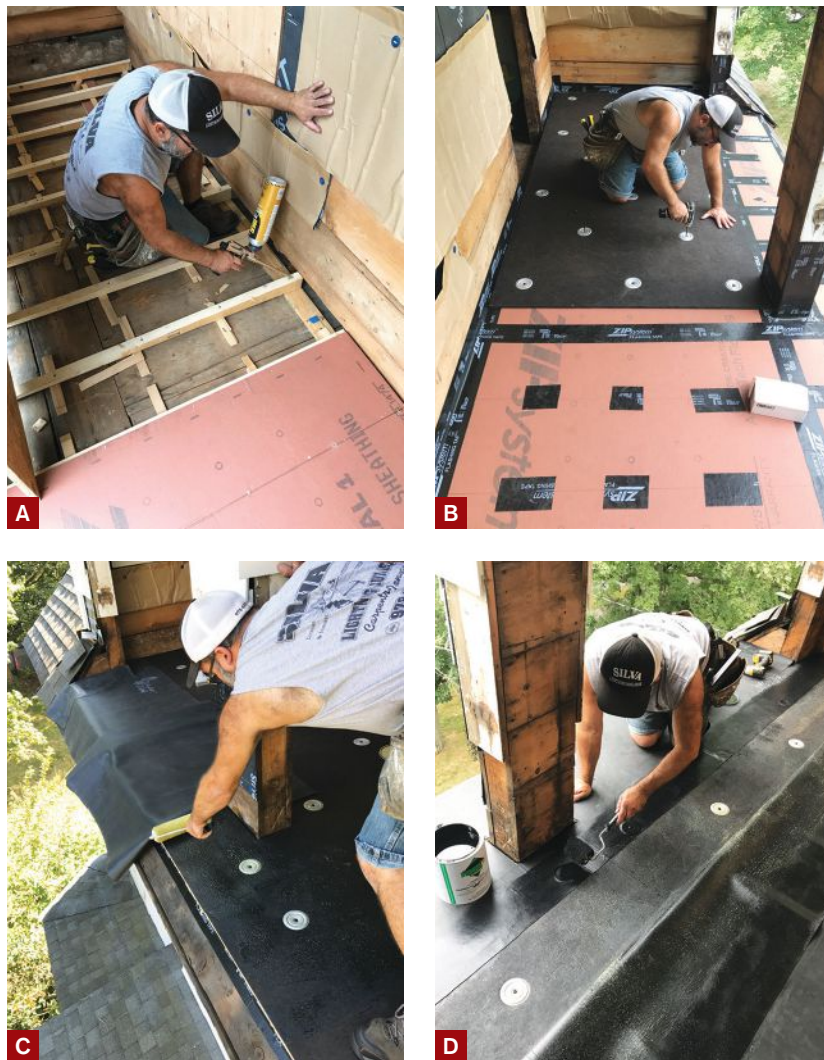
The author installed tapered sleepers followed by Zip sheathing to pitch the roof deck away from the house (A). Then he installed recovery board over the sheathing (B), followed by the EPDM roof membrane (C). The author used a neoprene bonding adhesive to glue the membrane to the underlayment, and a rubber-to-rubber adhesive at lap joints in the membrane (D).
